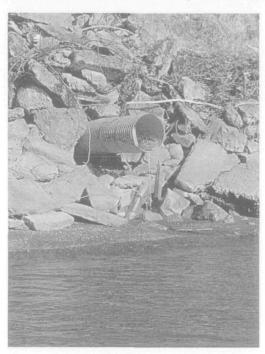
North end of Goldendale Aluminum facility. Heavily corroded steel outfall with iron oxide staining on concrete debris riprap surrounding outfall.
